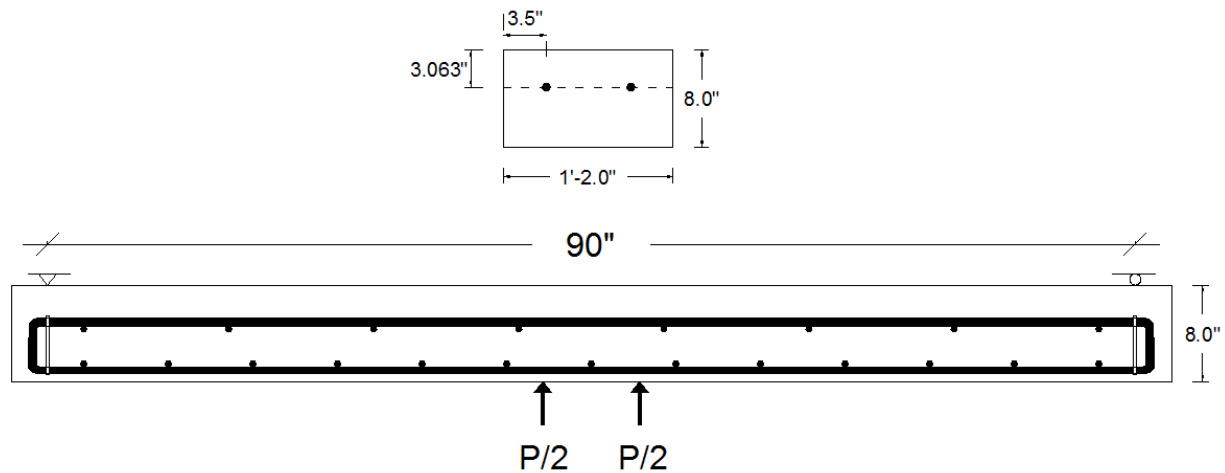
Longitudinal and Cross (only top bars shown) Section of Typical Slab
